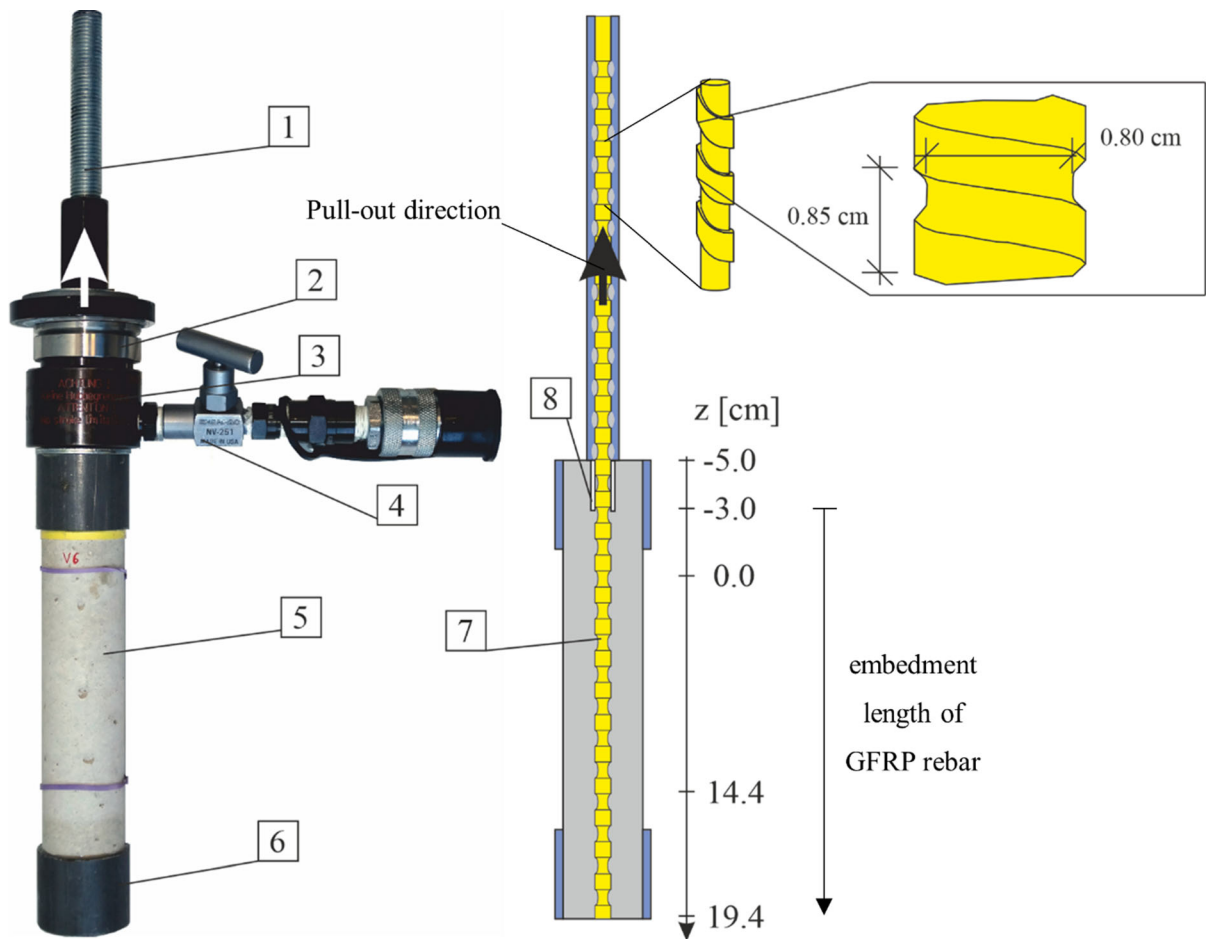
Experimental setup: 1—Steel fixing of GFRP rebar with cement mortar filling, 2—Joint bearing, 3—Hydraulic cylinder, 4—Hydraulic system, 5—Concrete sample, 6—CT sample adjustment, 7—GFRP rebar, 8—Adhesive tape for non-bonded area
